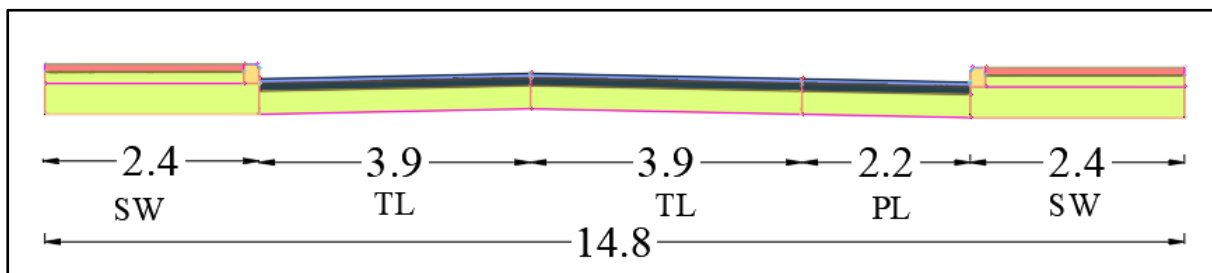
At Section No.6 Existing Cross Section – Hittin Street
